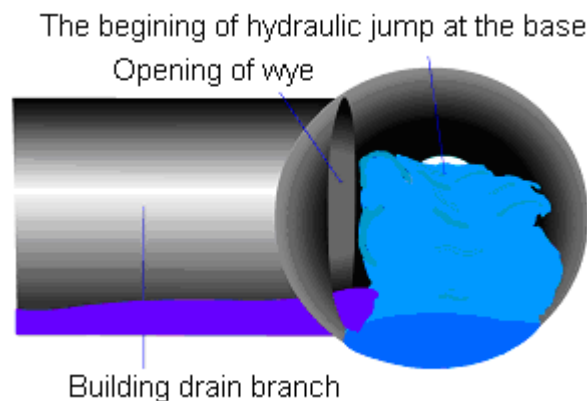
Cross sectional view of a building drain branch during 'Hydraulic Jump' phenomena (More than ¼ full)
